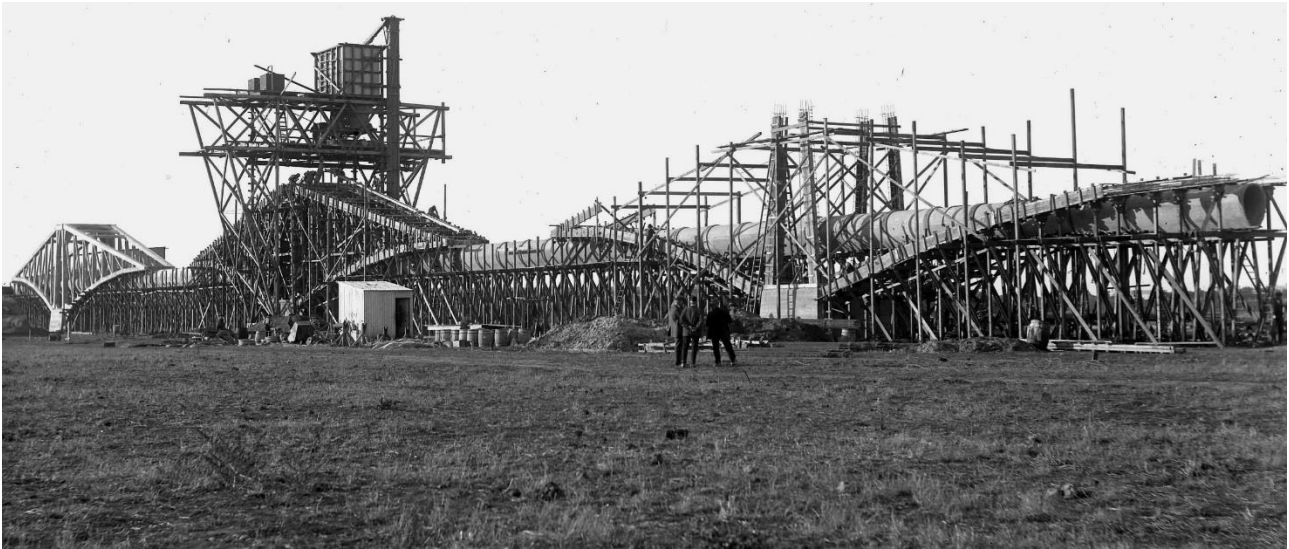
Construction sequence photograph showing (right) temporary scaffolding and erection of steel reinforcement and timber formwork; (centre left) completed truss formwork and concreting gantry; (far left) completed concrete web truss (prior to capping of pier tower)
